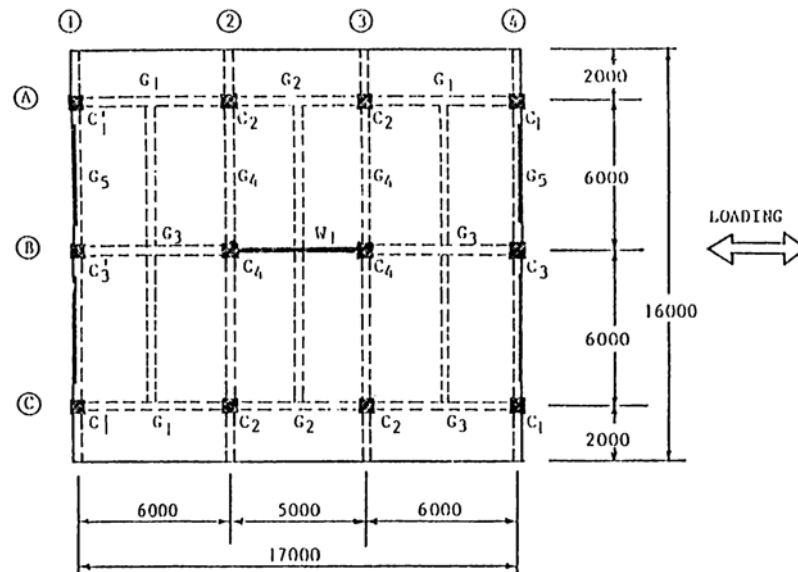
Plan of the Seven-Story Full-Scale Building [12]
